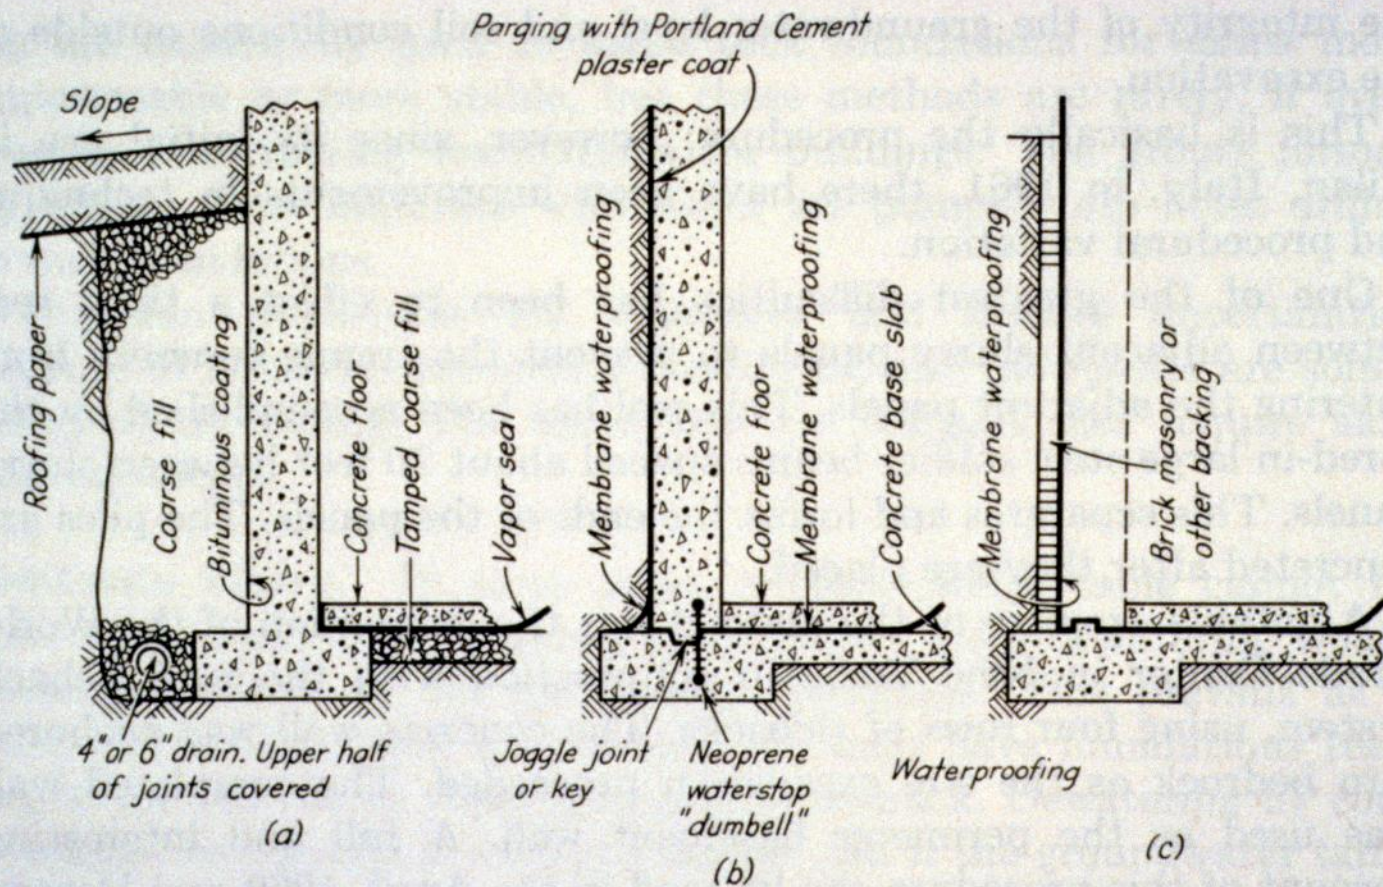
Dampproofing and waterproofing basements. (a) Damp-proofing. (b) Outside of wall accessible. (c) Outside of wall inaccessible.
